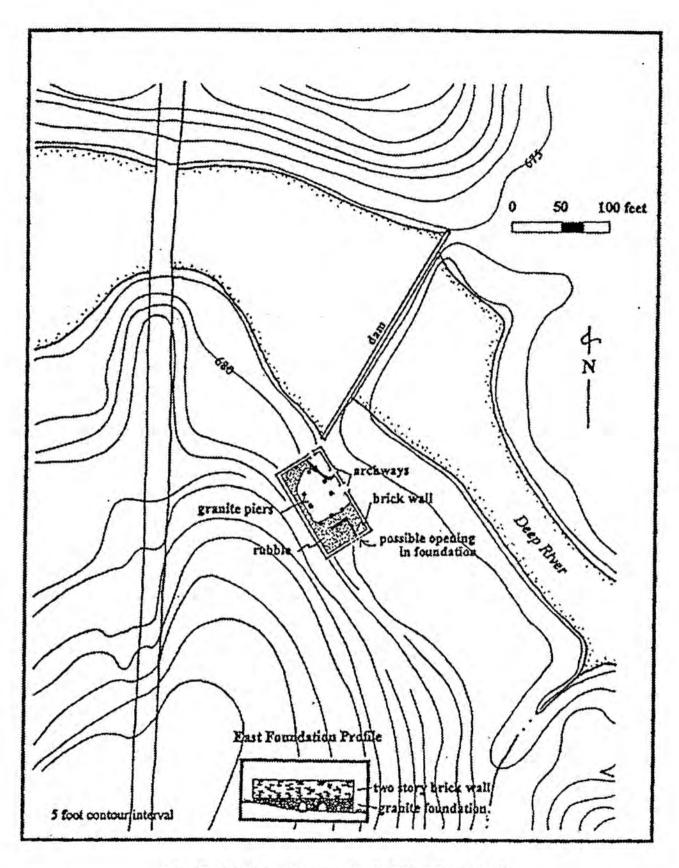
Site Plan of Freeman-Bodie Mill & Dam (G 07)
